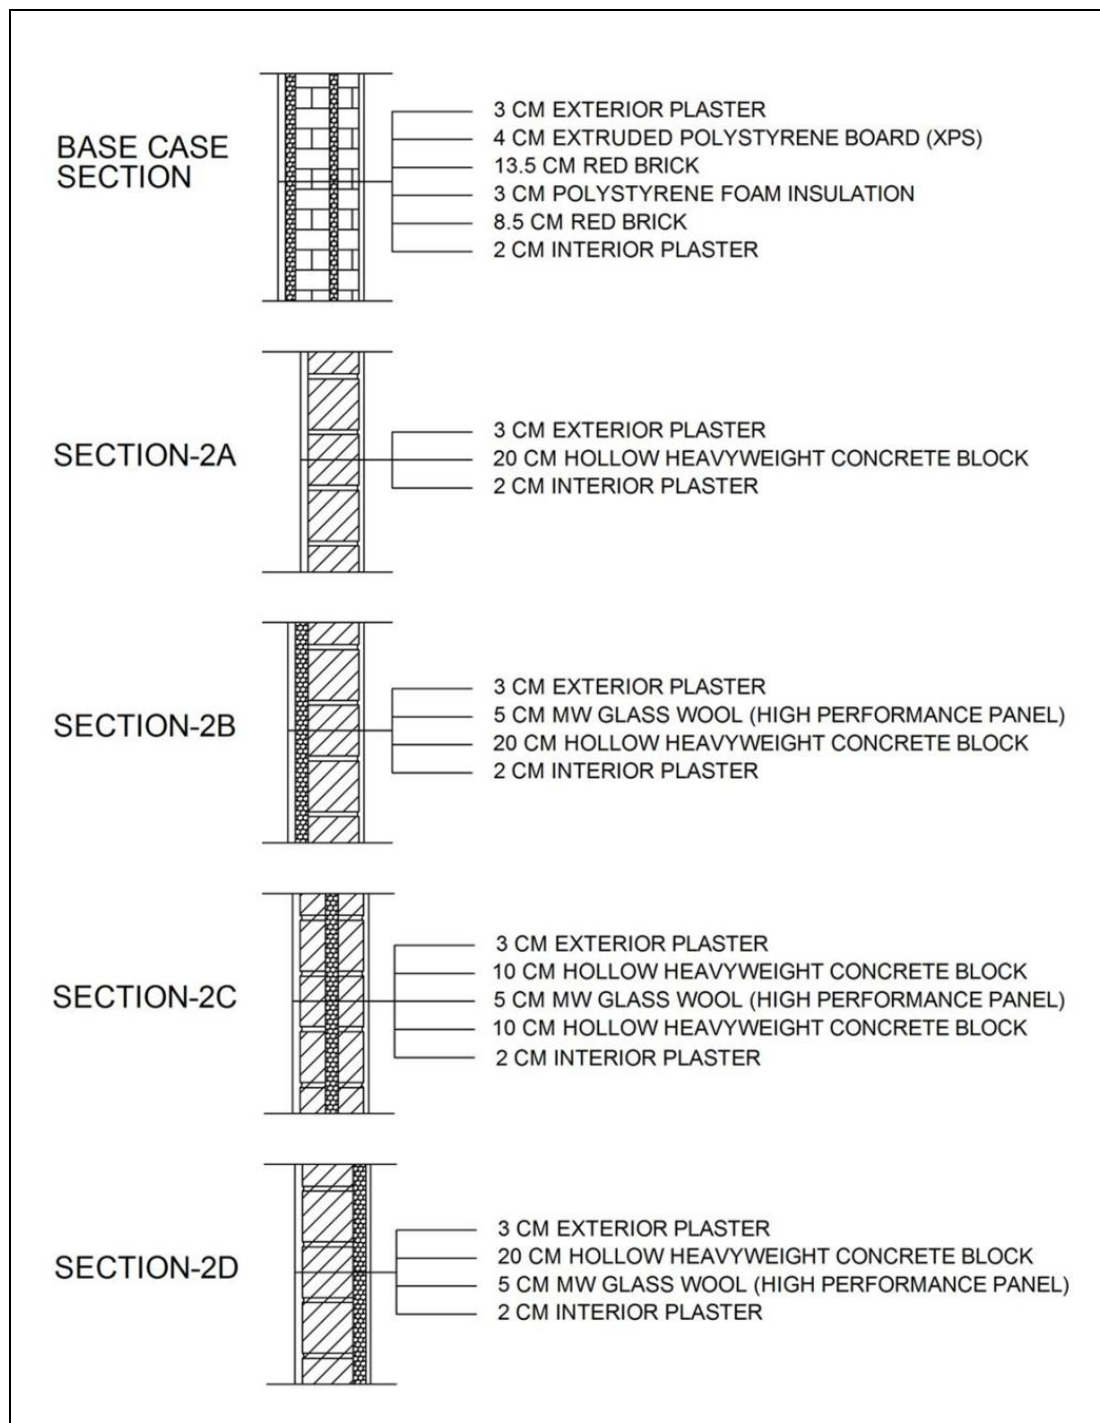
Hollow Heavyweight Concrete Blocks for four different Wall System Sections and The Base Case Section.
